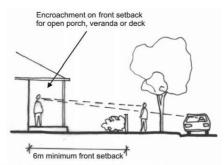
Dwelling design with front porch that allows surveillance to and from the street
